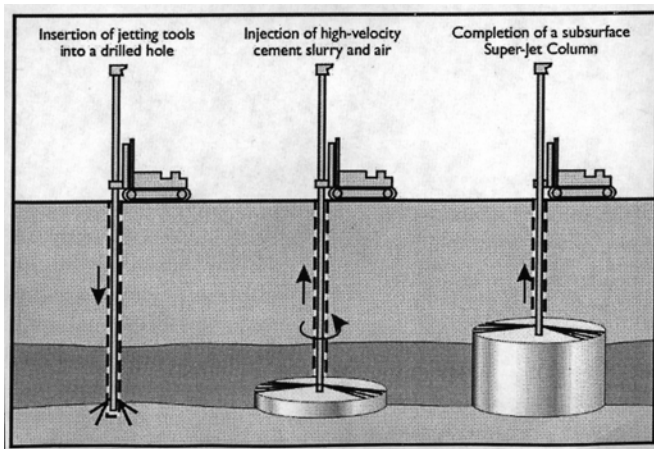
Installation Details of Jet-Grouting Soil Columns (Courtesy of Hayward Baker Inc.)
